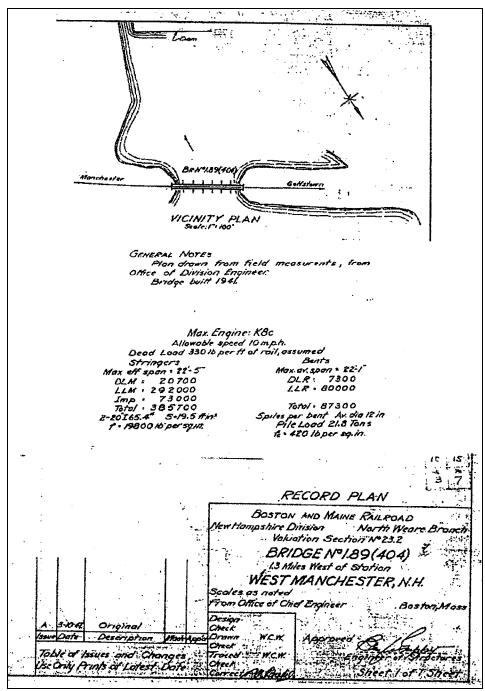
B&MRR Bridge No. 1.89 over Piscataquog River, West Manchester, NH. Title block, location plan and notes from plans. [Source: "Record Plan, B&MRR Bridge No. 1.89 (404) West Manchester." Dated 3/10/42]
